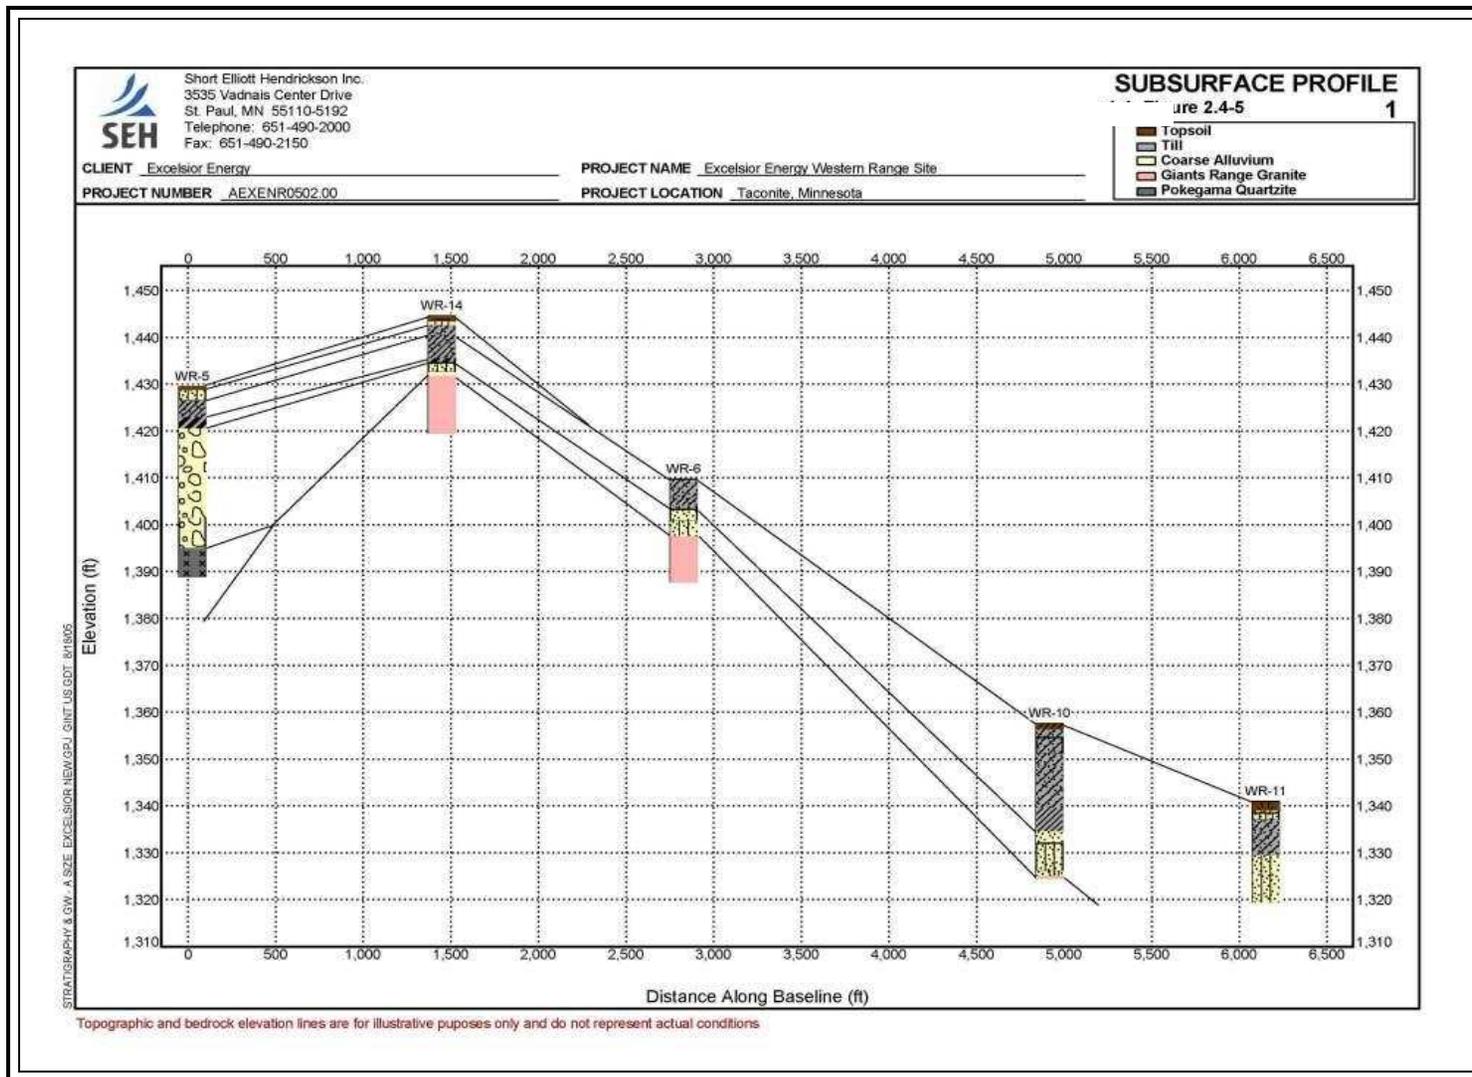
Subsurface Profile of Cross Section “2-2”
